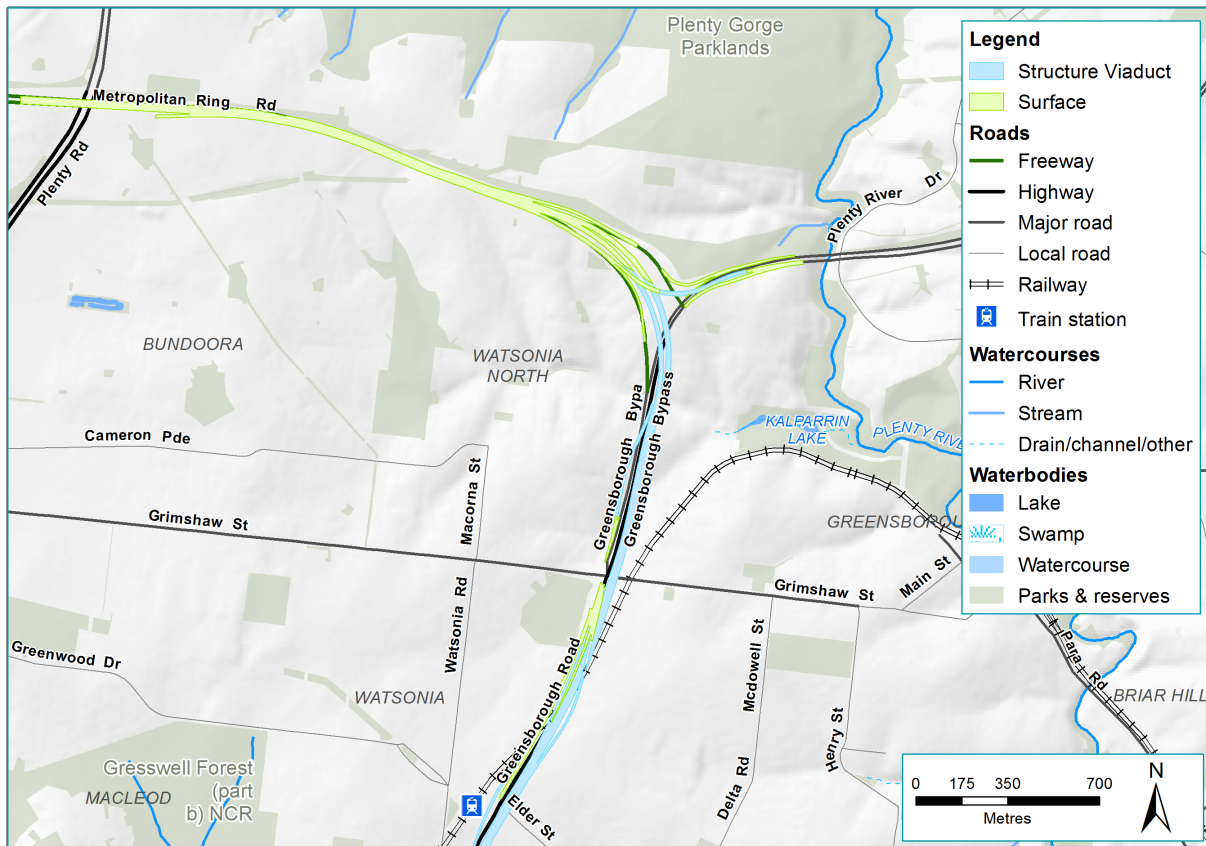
Option A: North East Link as an elevated road over Greensborough Bypass at the M80 Ring Road interchange
